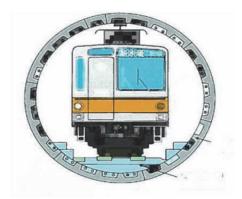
Underground Station by cut and cover Fig. 13.2 Shield Tunnel between Stations by TBM
